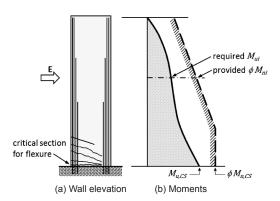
Provided versus required flexural strength in a wall with a single critical section.
